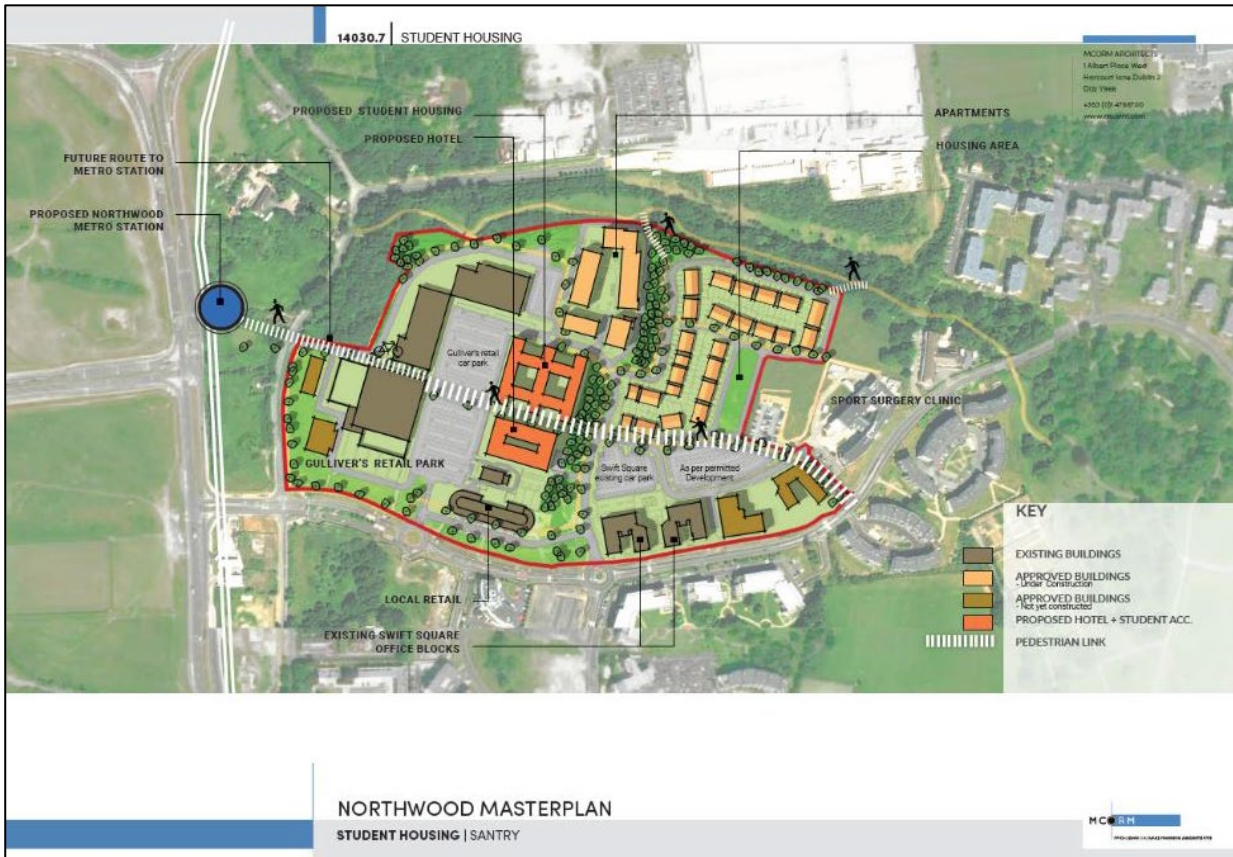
Schematic Site Layout Student Housing and Hotel ³
